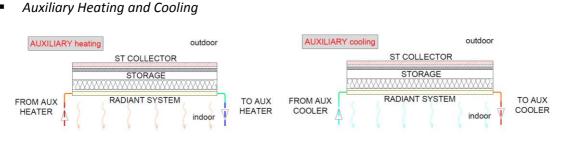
Façade case study_Auxiliary Heating/Cooling layout
